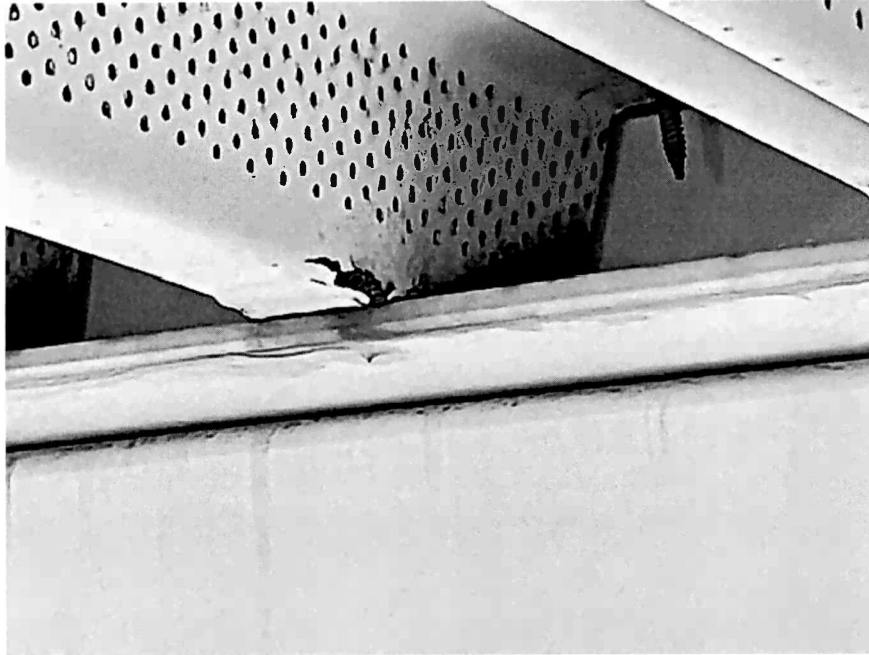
Severely damaged roof deck bearing at west wall
